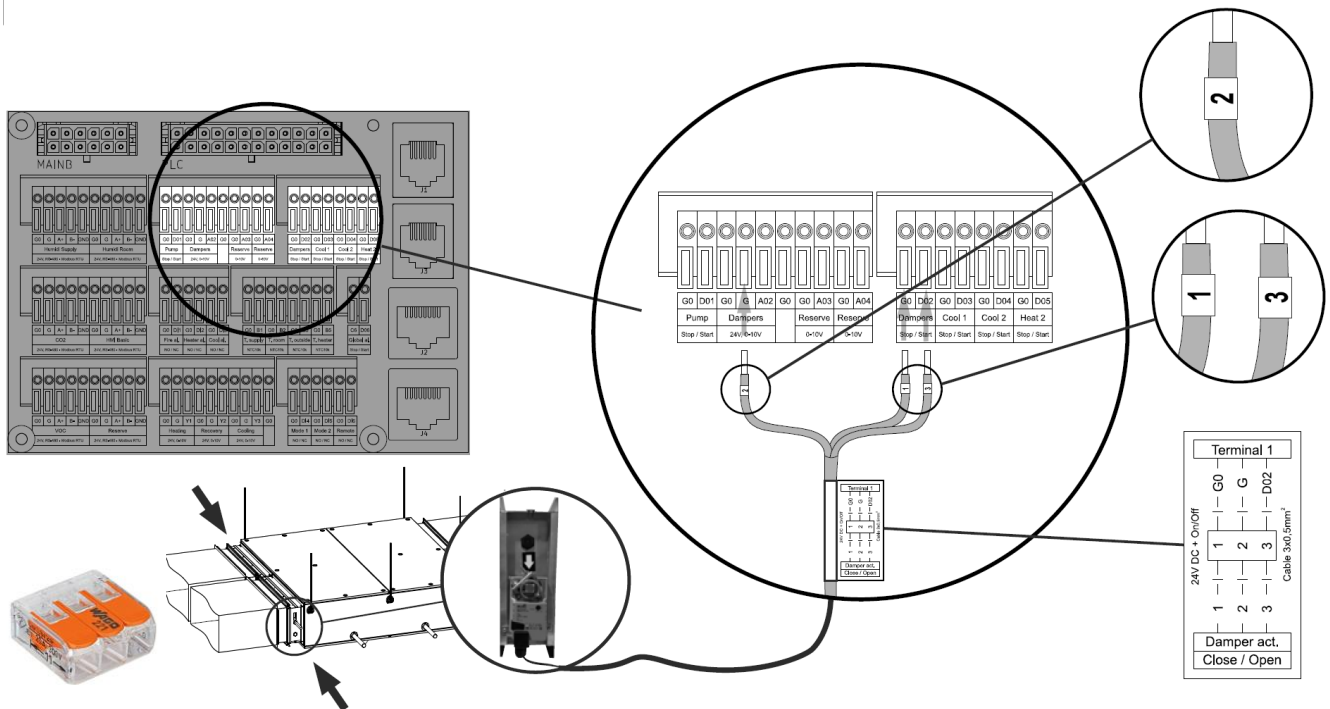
Connection of the Air Damper Actuator to the switchboard; Ports: Dampers G, Dampers G0, D02
